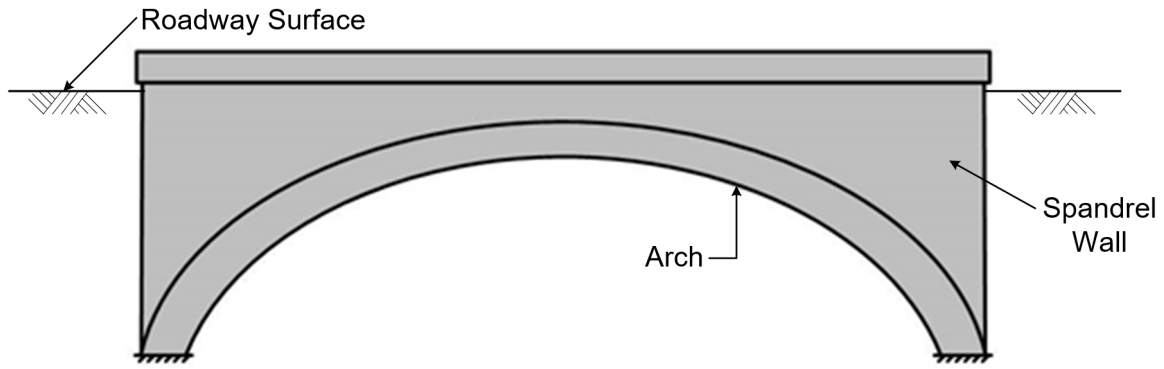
Elevation View – Closed Spandrel Deck Arch
